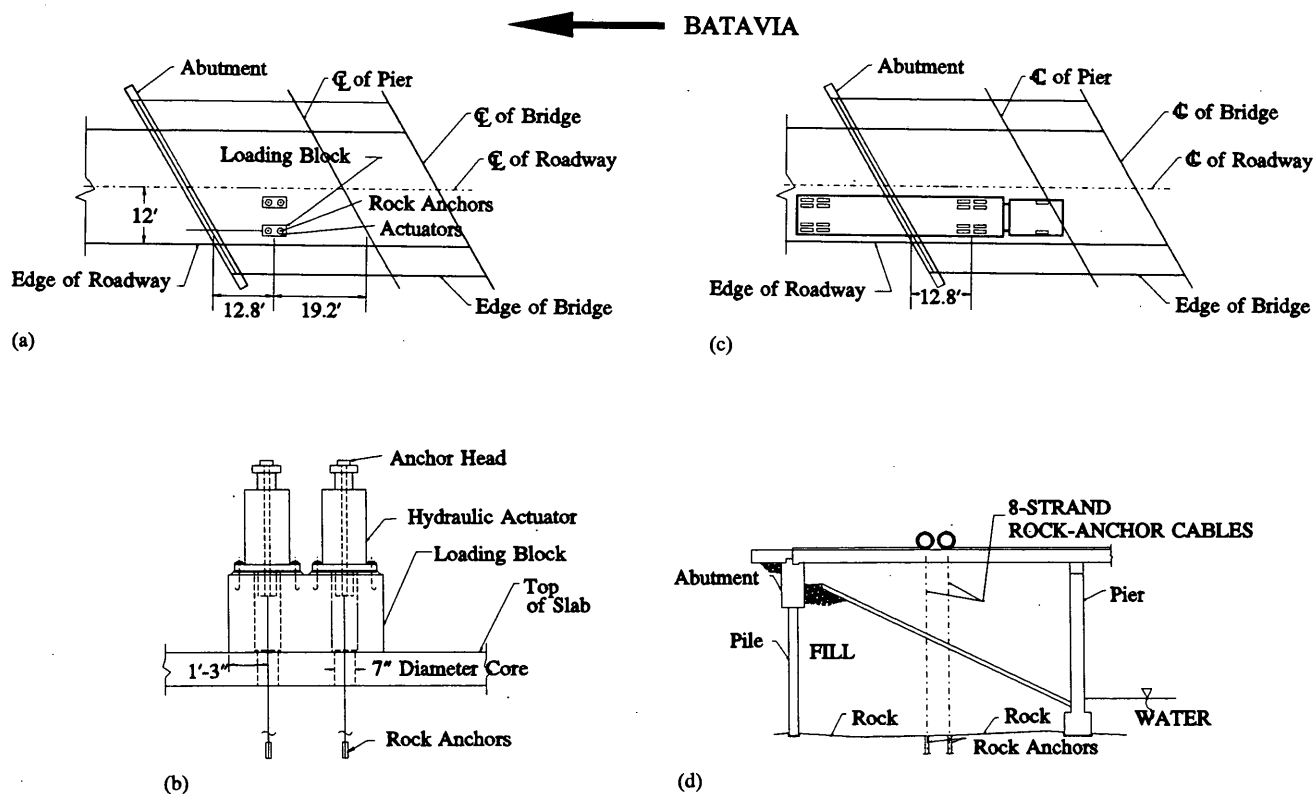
Plan view (a) and elevation view (b) of loading system; plan view (c) and elevation view (d) of simulated loading.
